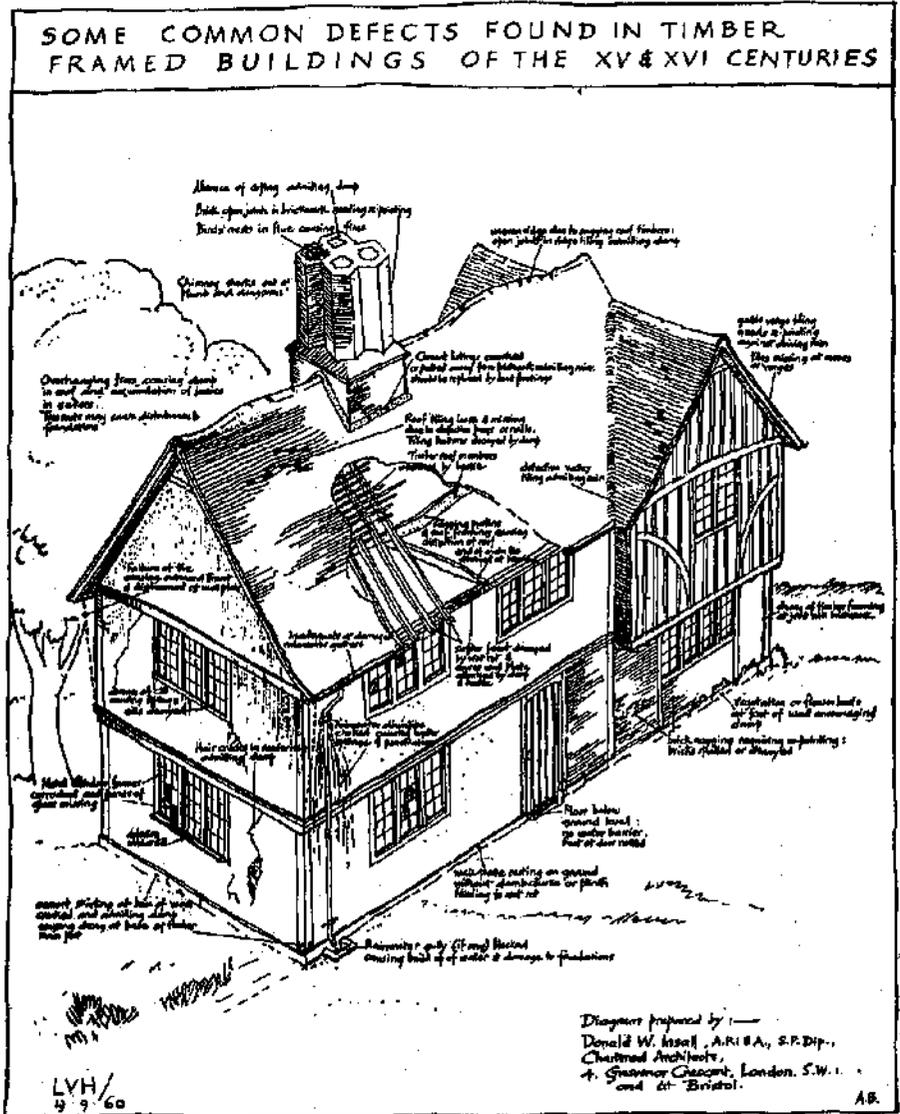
Some common defects found in timber framed buildings of the XV. and XVI. centuries.
